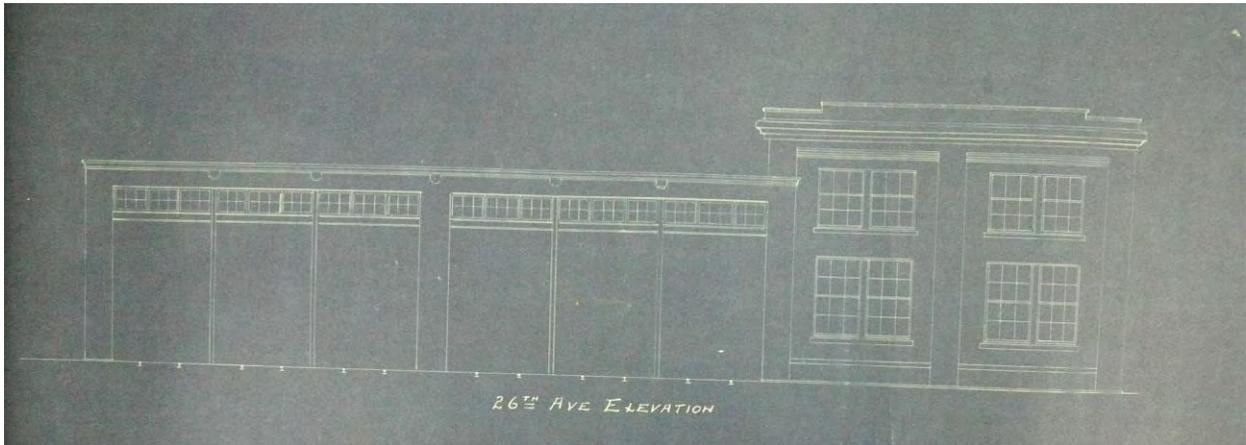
26th Avenue elevation, source: Northwest Architectural Archives
